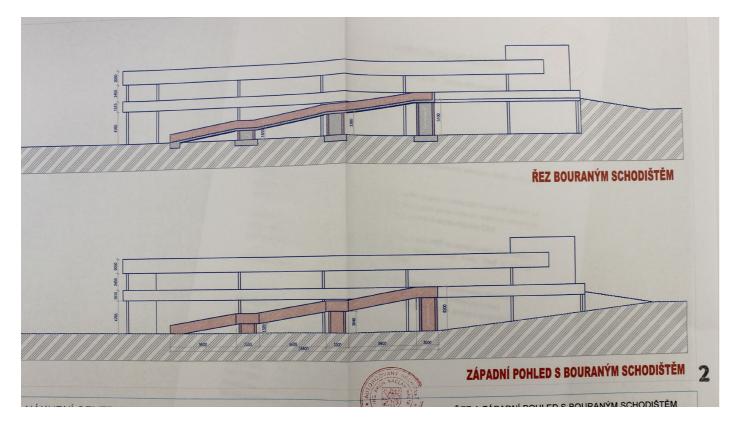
Section and elevation of proposed demolition of outside staircase, 2015 © Building Authority of Prague 8 - Archives, 401 -5/5 objekt B
